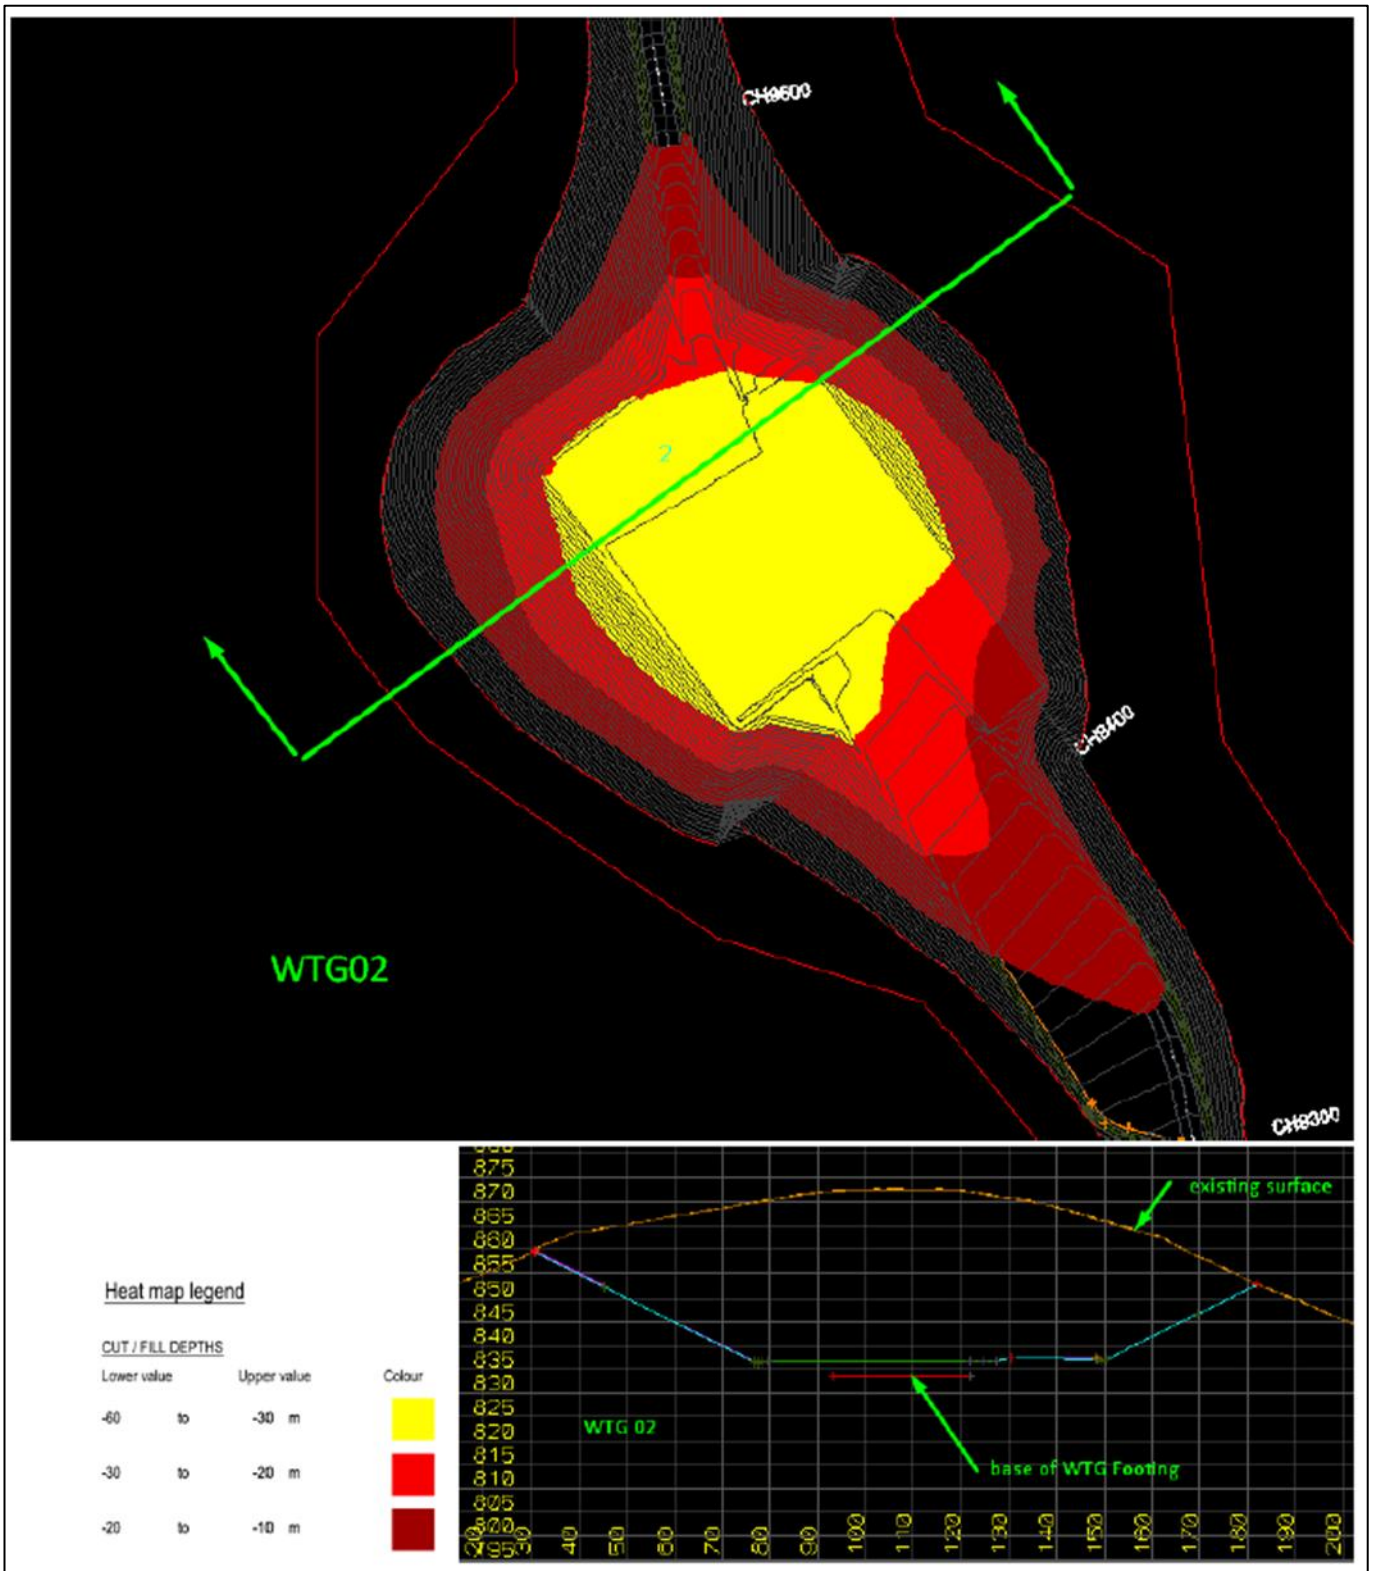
WTG 02 Plan with “heat” depth contour map and section through WTG/track and blade laydown
